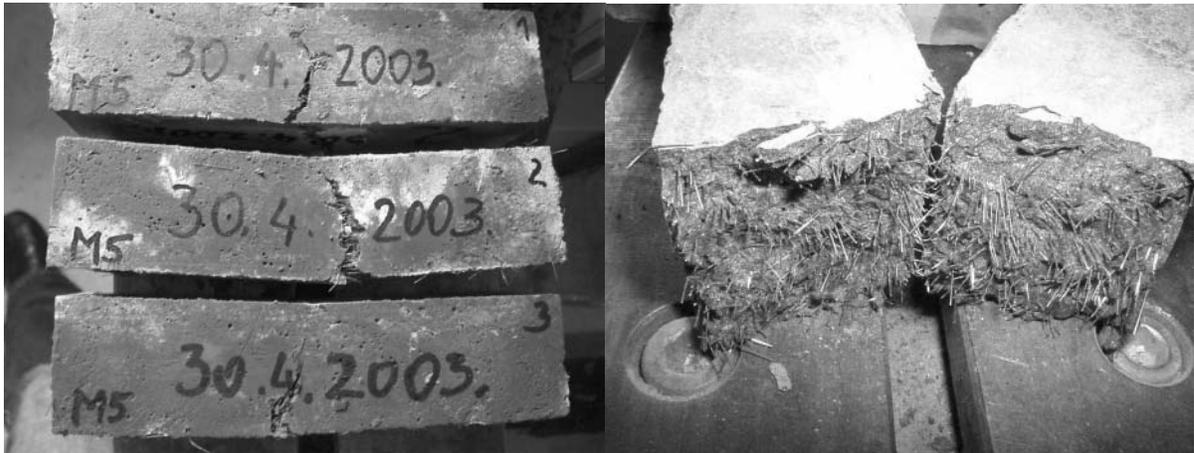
and Fig. 17 View of prisms submitted to testing and prism cross section after failure
